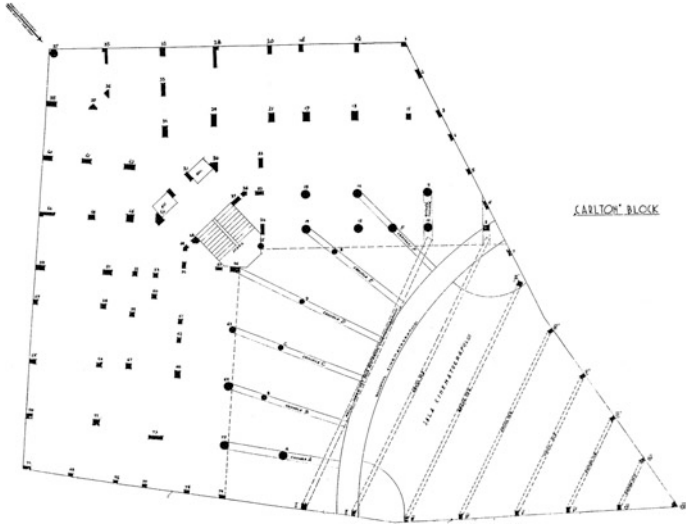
Sketch of Carlton building layout, featuring the tower, two wings and the cinema hall behind (Achim 1941)
